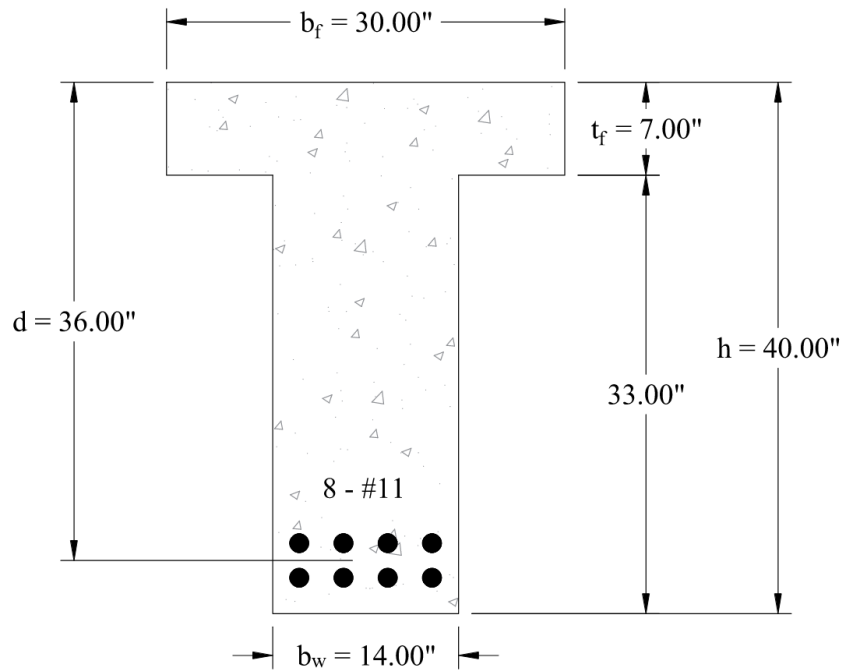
Flanged Reinforced Concrete Beam Cross-Section
